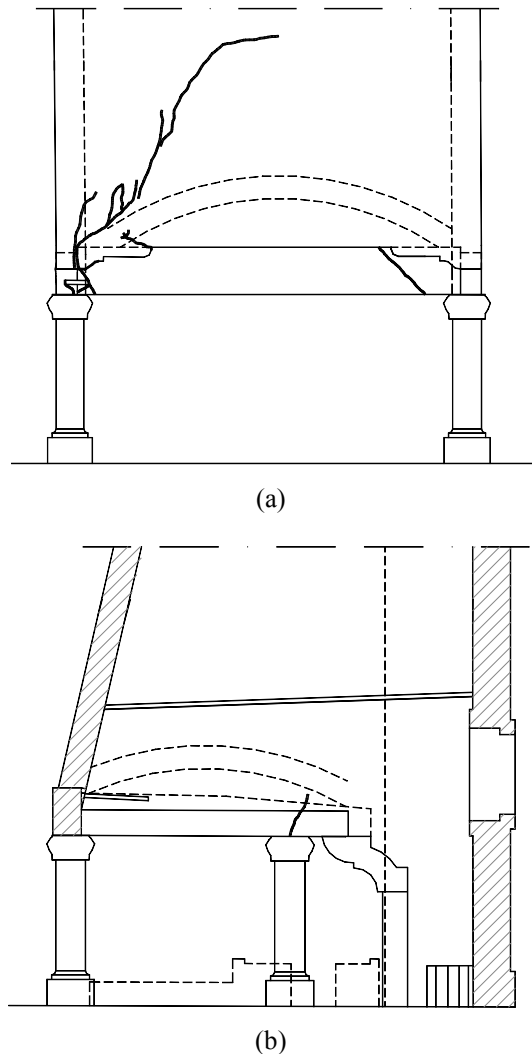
Geometry and observed cracking patterns: (a) main wall; (b) left side wall.
